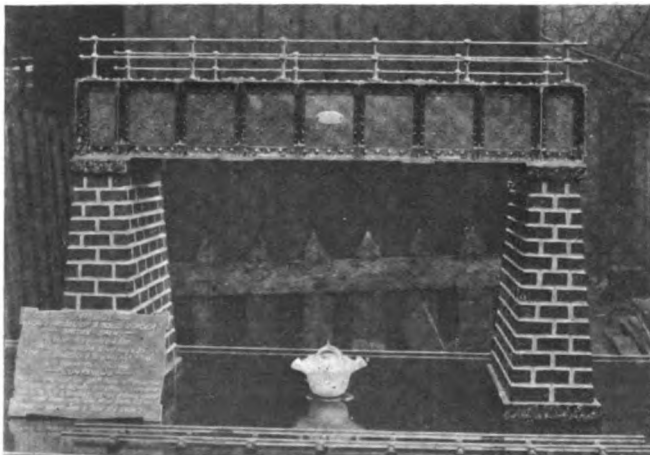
$\frac{1}{4}$ -IN. SCALE MODEL OF GIRDER BRIDGE.
